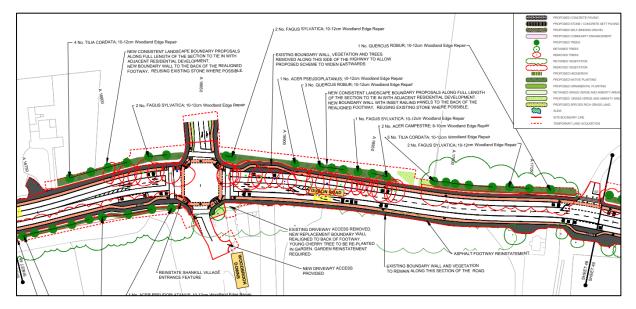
Extract from Landscape Drawings at Woodbrook SHD (Sheet 48)
